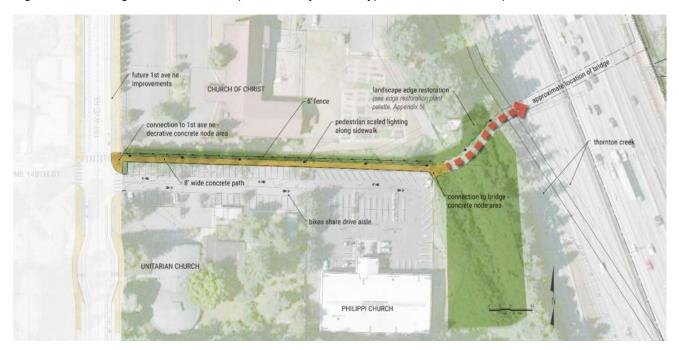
Option 1 - Minimal Build-Out Plan View
